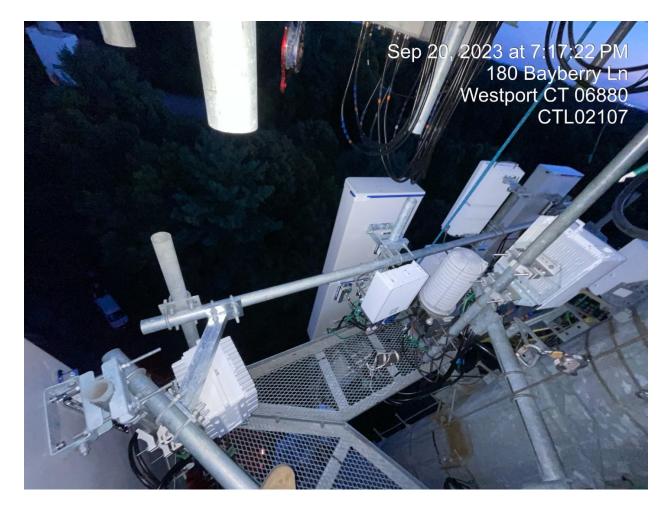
Installation of Antennas and Equipment on Beta Sector
